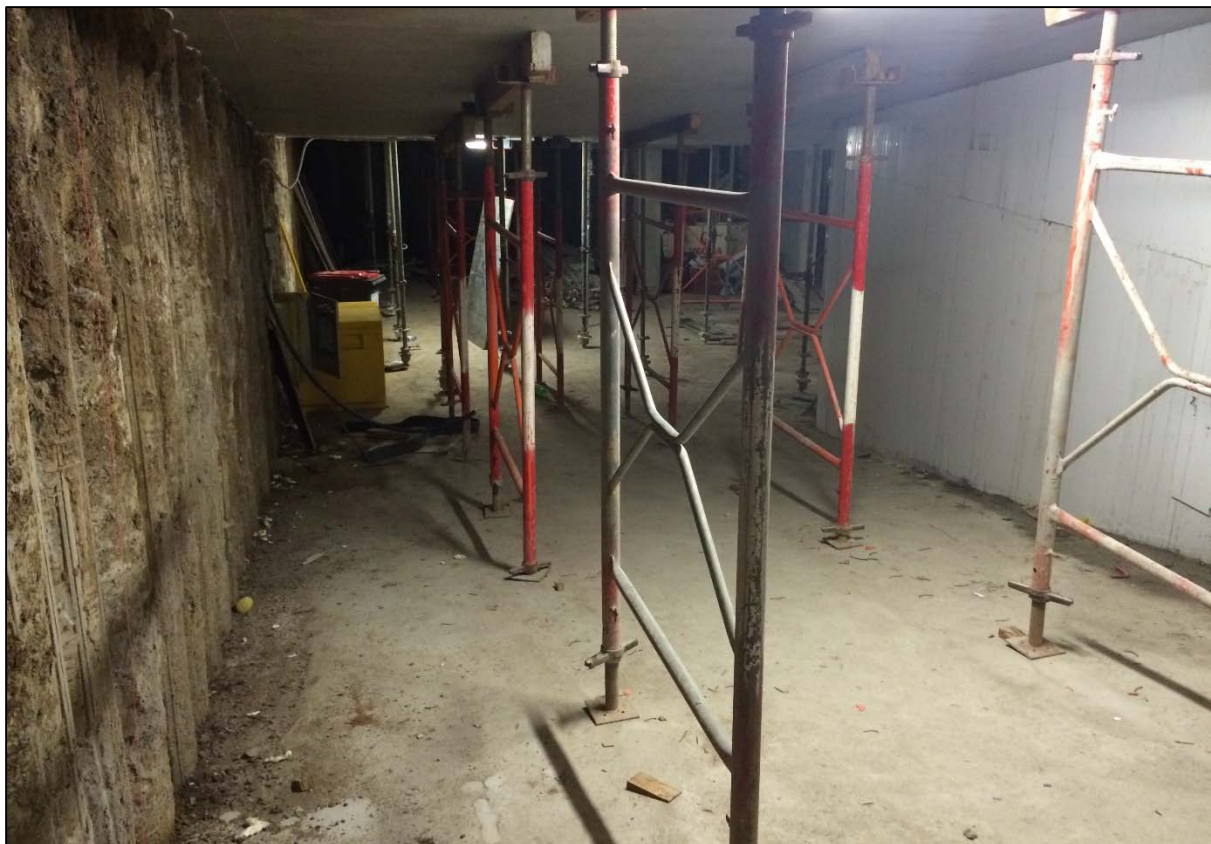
View down second ramp from Basement 1 to Basement 2. When the slab has cured properly, the support braces are reduced.
